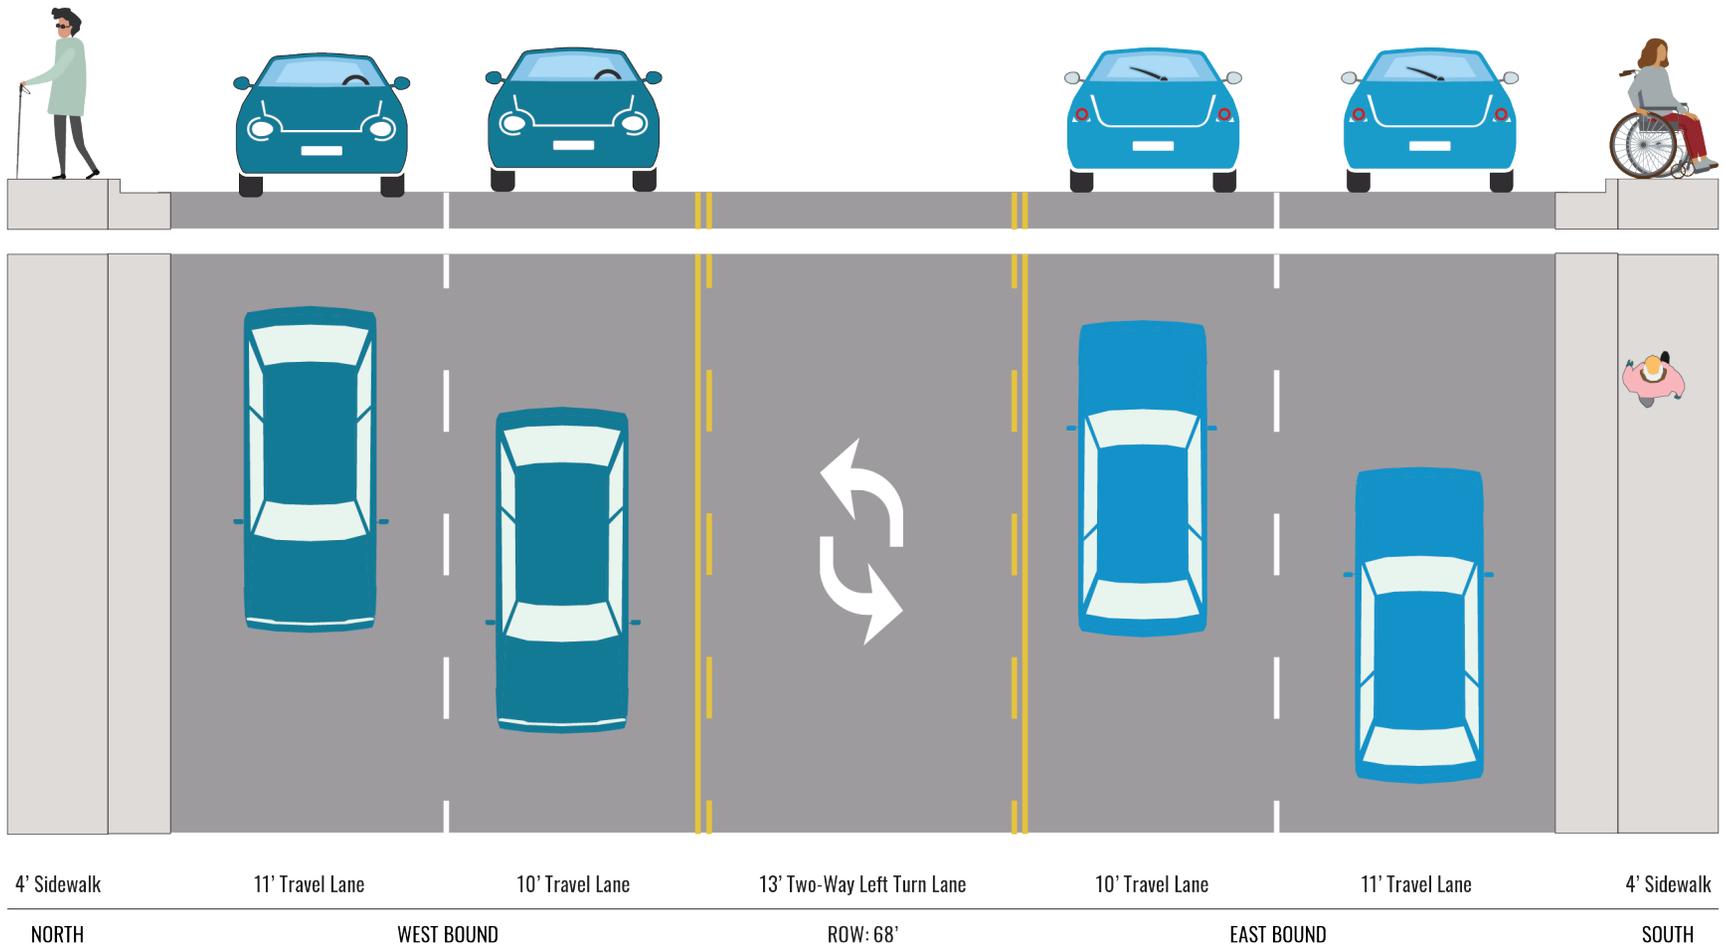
Typical cross section today – 4th Avenue to 13th Avenue
